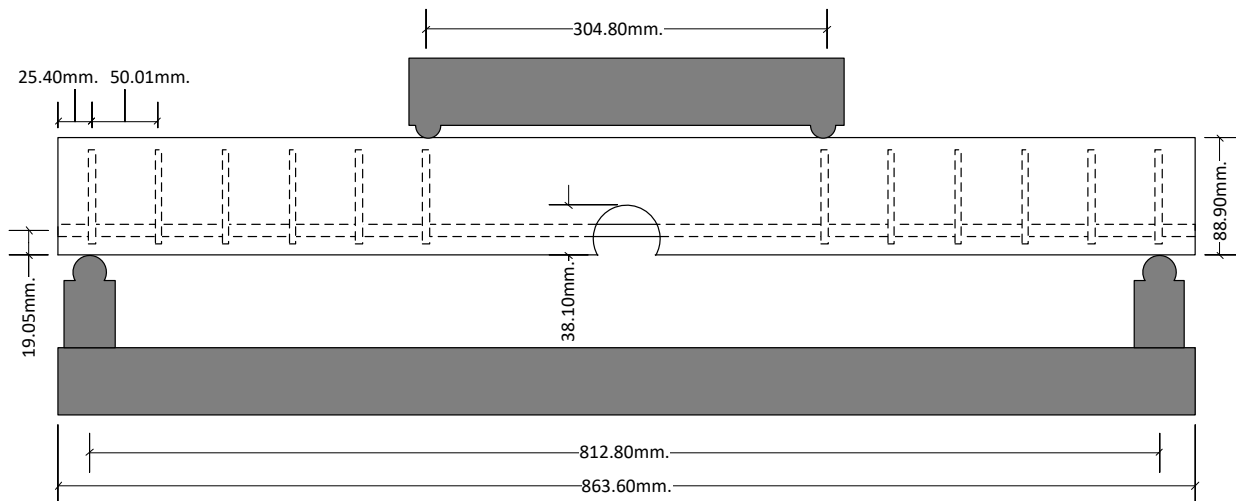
Small-scale test beam shown with rebar access hole, reinforcement detail, and support and loading points
